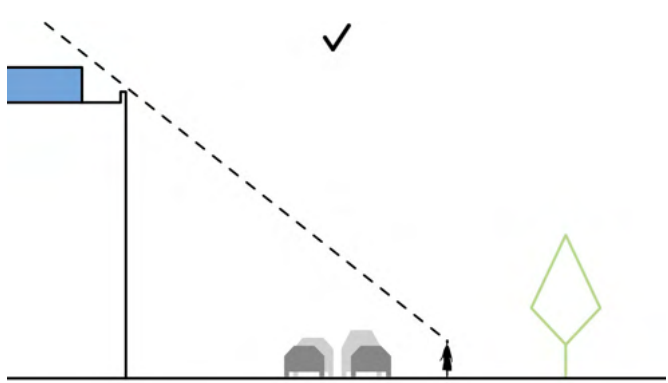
Rooftop equipment should generally be designed not to be visible from the street or nearby points of elevation. If it is visible then the materials and details should complement the elevations.
